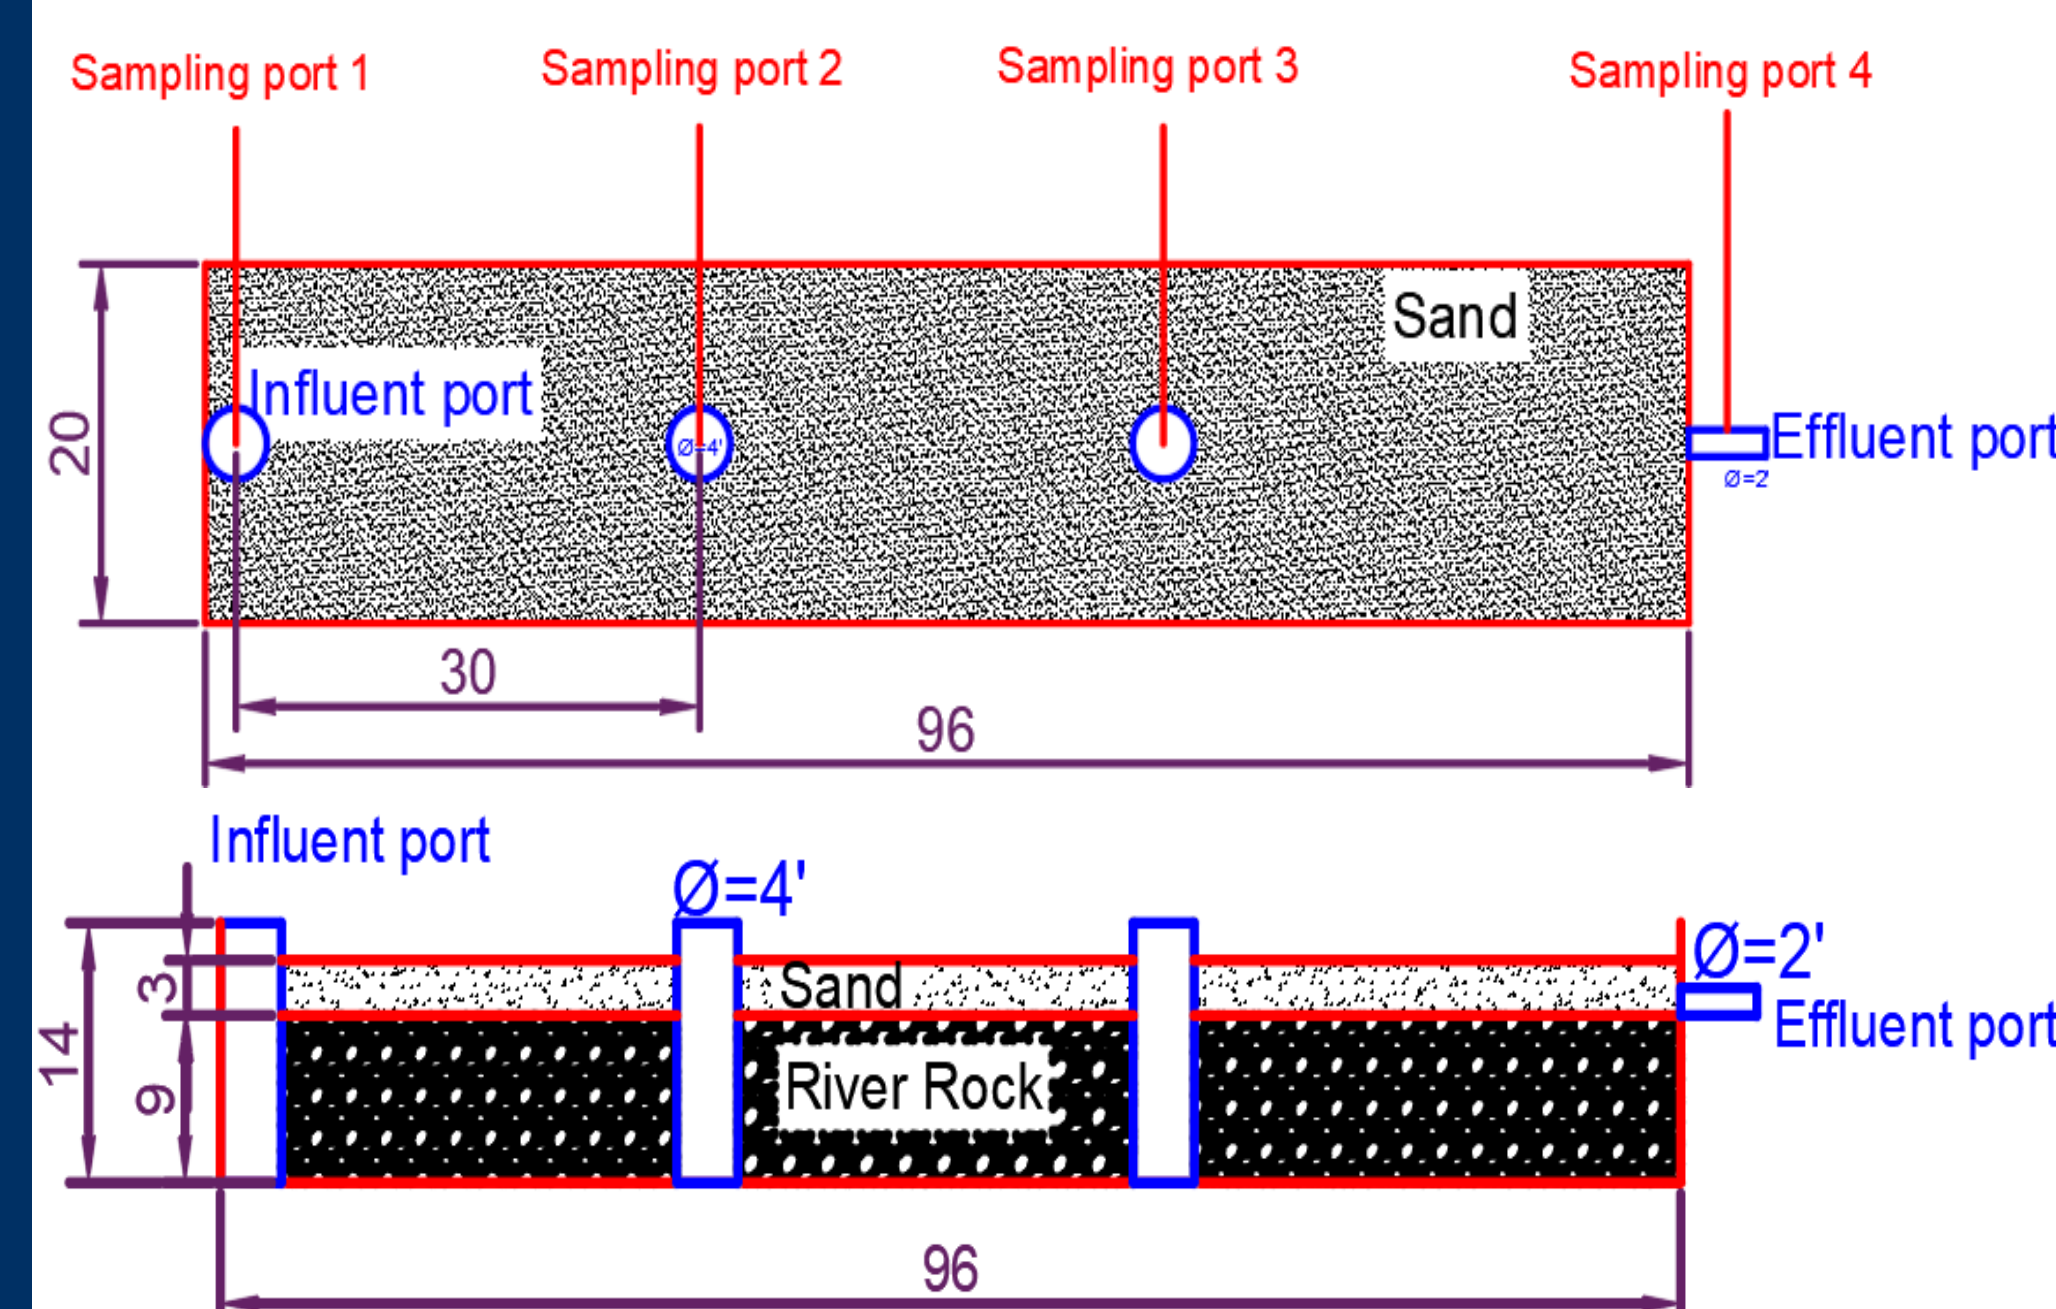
Plan and profile of Pilot-scale Gravel conveyance
